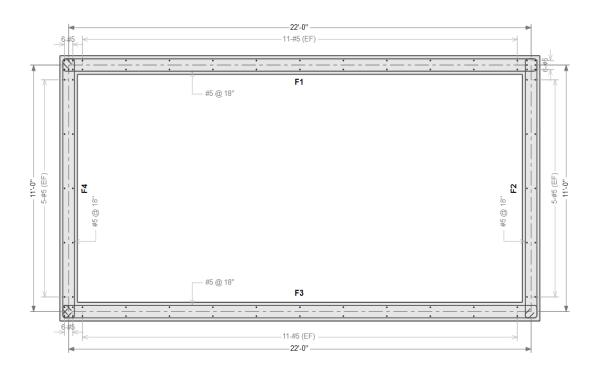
Reinforcement details of Over Head Water Tank wall cross section.
